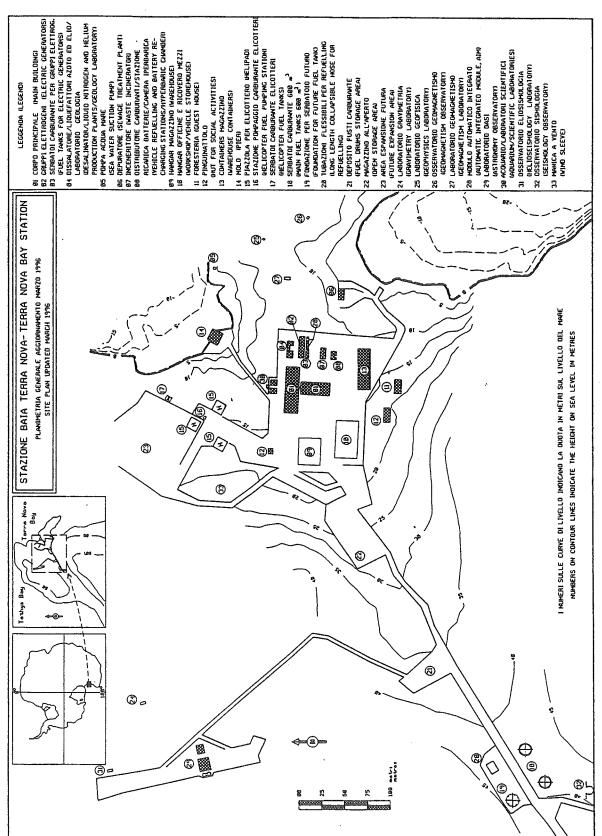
TERRA NOVA BAY STATION - SITE PLAN
